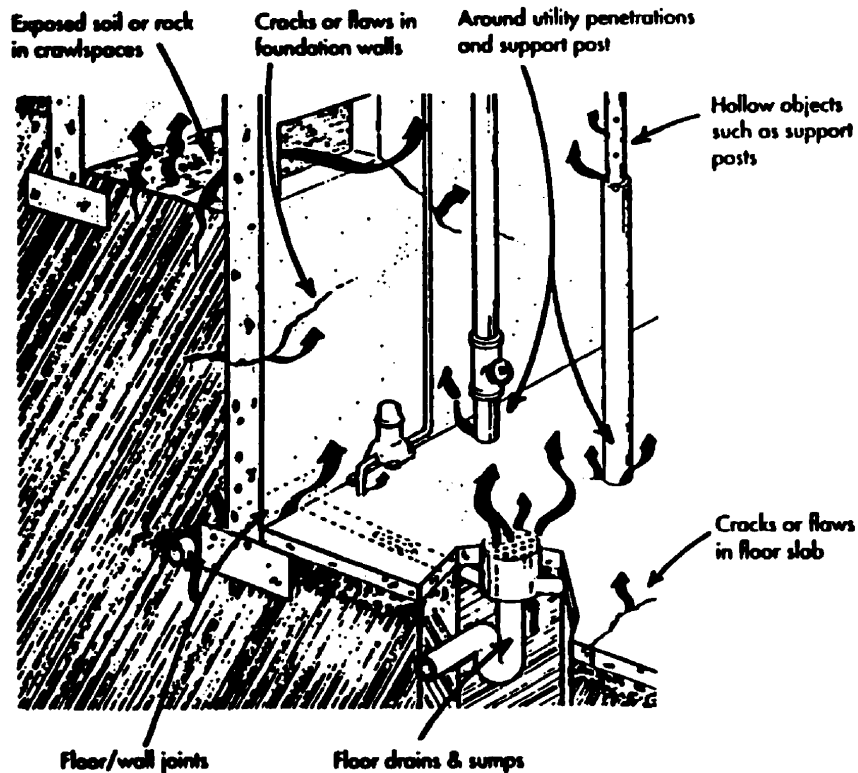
Typical radon entry routes in poured concrete foundation walls and floors
